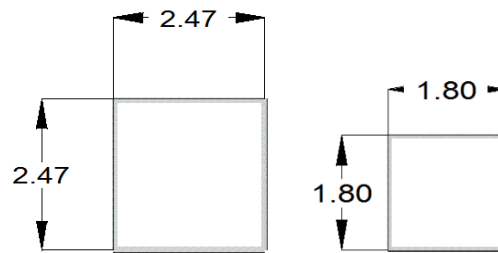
Horizontal bracings: Horizontal 4 (left) and Horizontal 6 (right)
